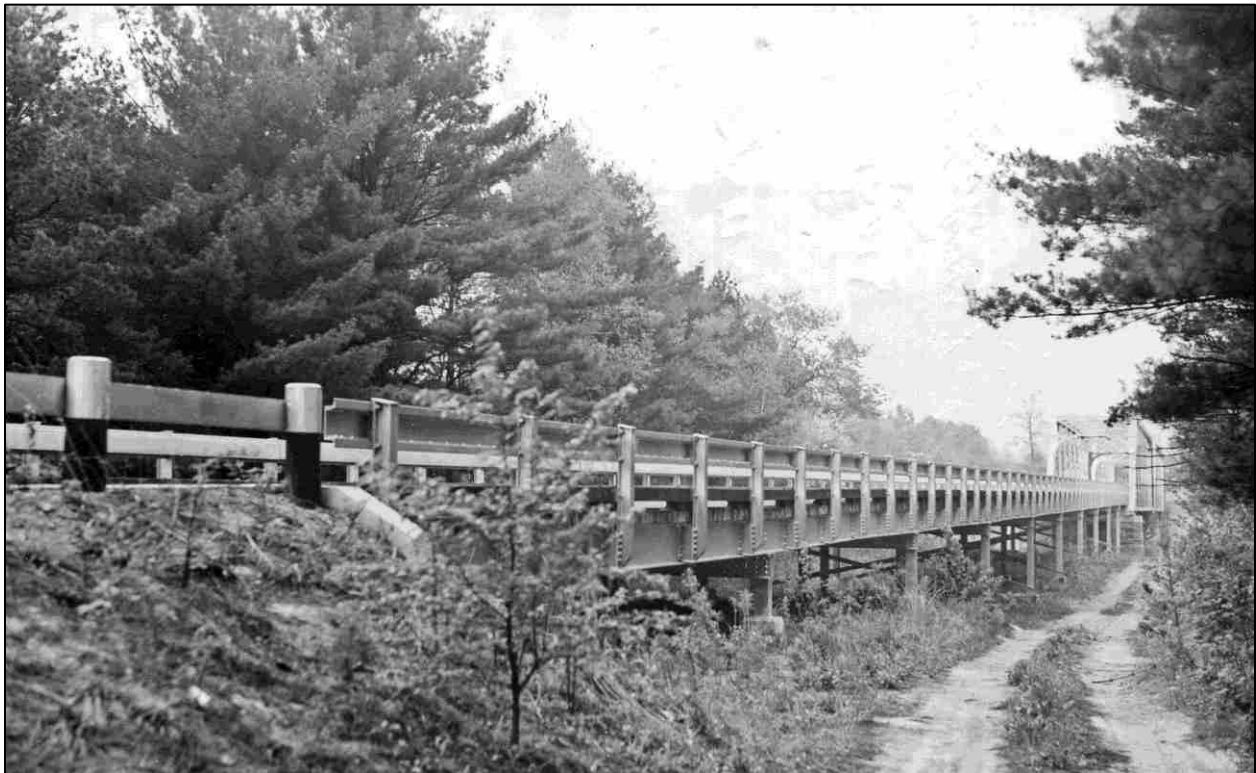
Sewall's Falls Bridge, south approach trestle built 1937. Field inspection photo made by NHHD engineer Wendell H. Piper, May 15, 1942 (NHHD Bridge Inventory Card, Concord 070/117).
